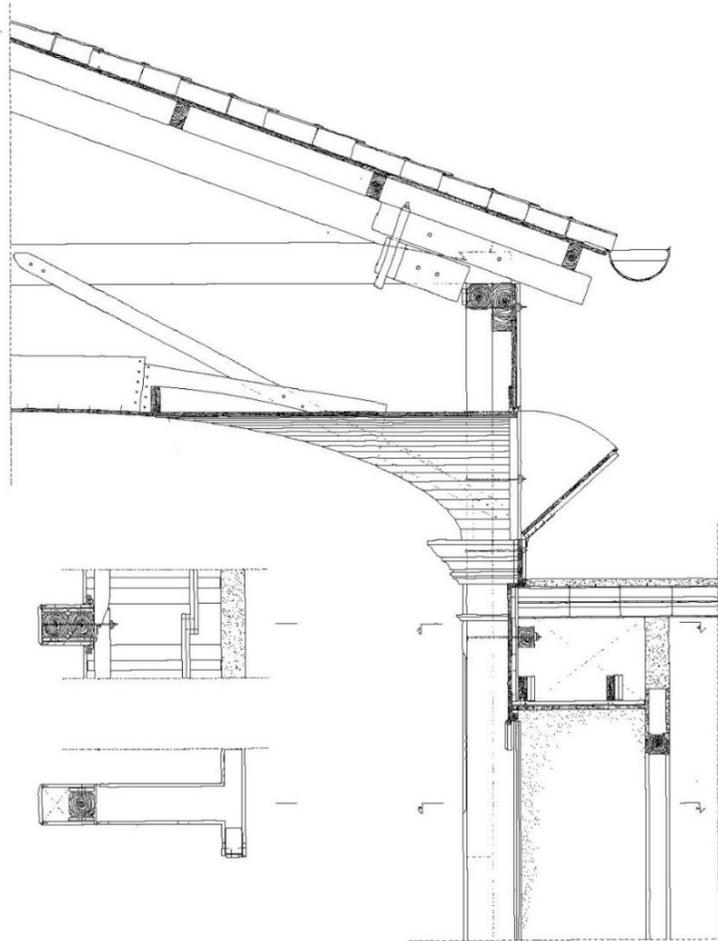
17 Covering with truss ,Garibaldi Theatre Palermo.
